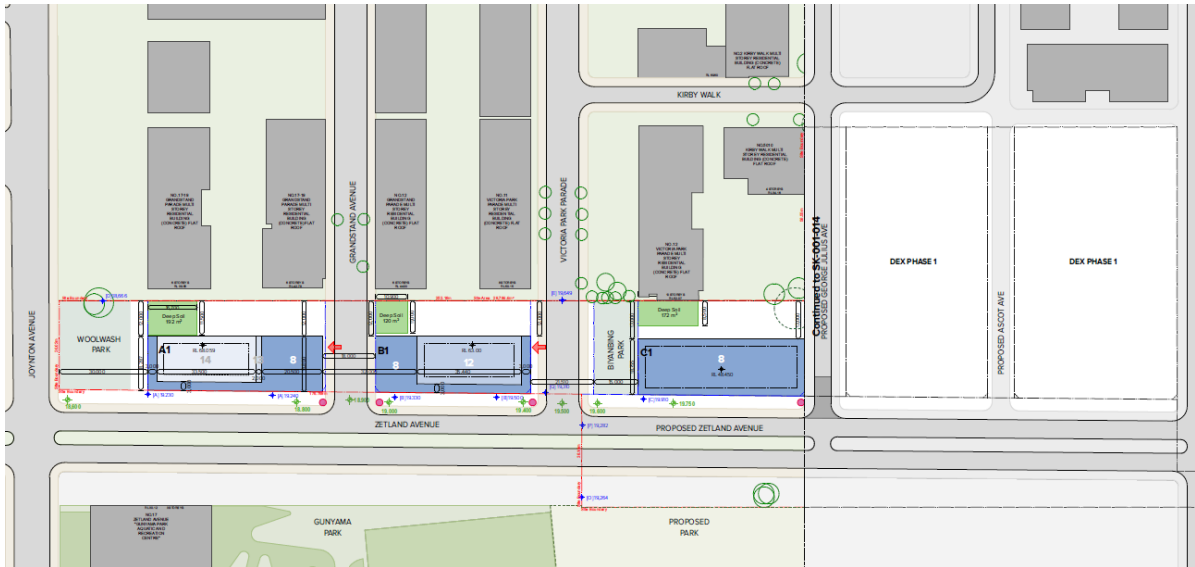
Indicative building envelopes for Buildings A, B and C attached to the competition brief
